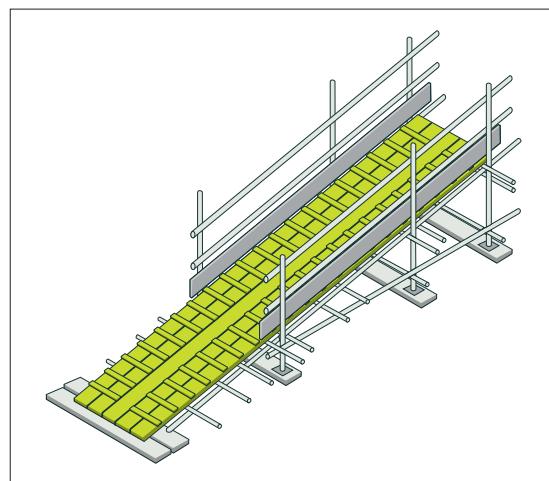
Typical barrow ramp erected using tube and coupler scaffold
